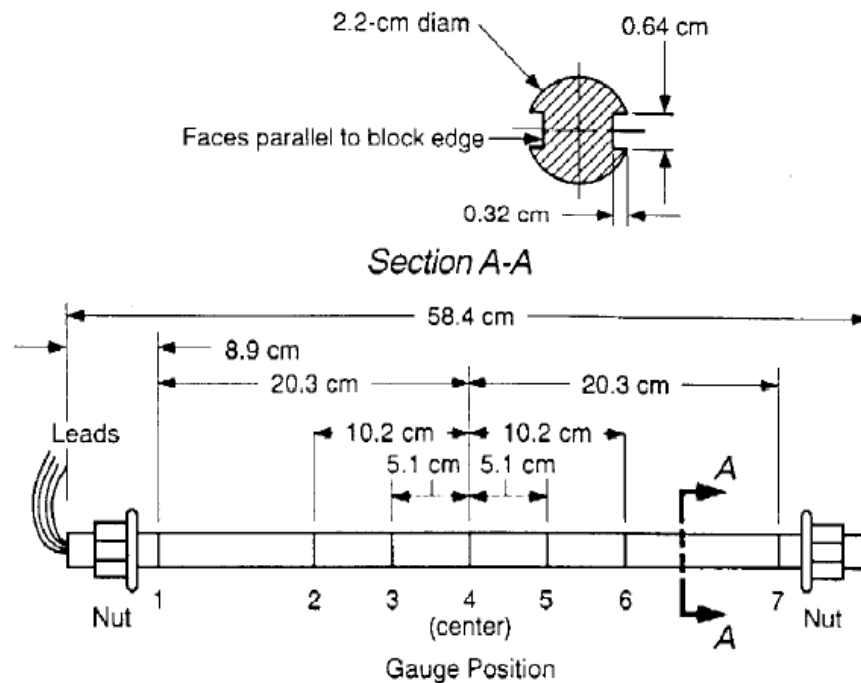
Instrumented rebar bolt (McHugh and Signer, 1999)
